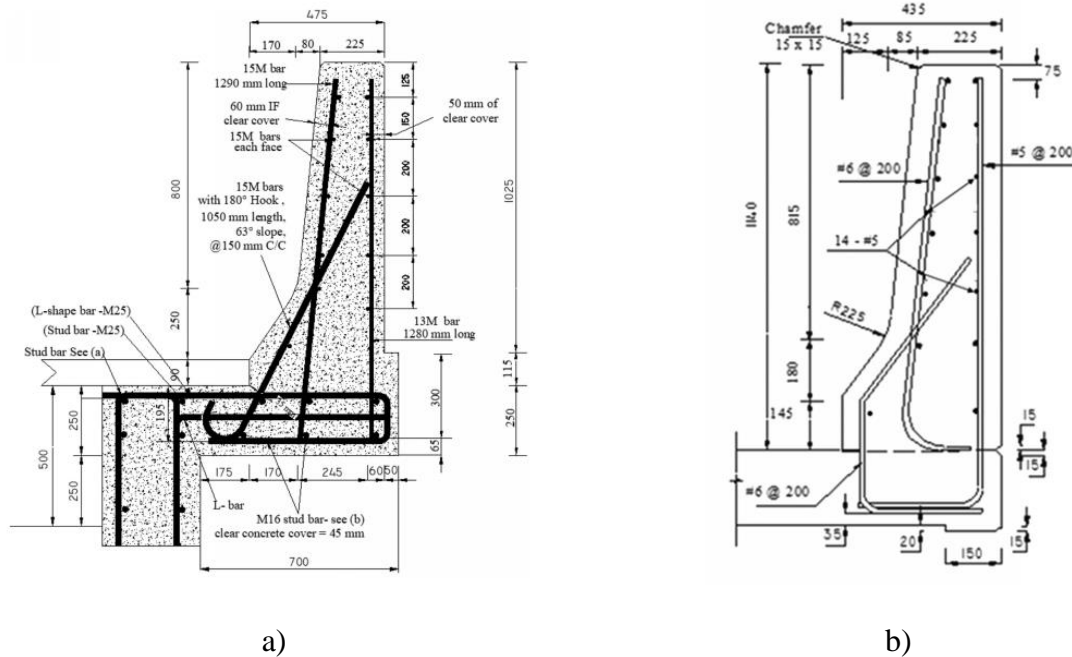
Cross section of crash-tested barrier (Sennah et al. 2018):
